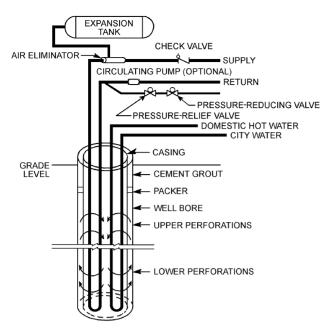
Typical Connection of Downhole Heat Exchanger for Space and Domestic Hot-Water Heating (Reistad et al. 1979)
